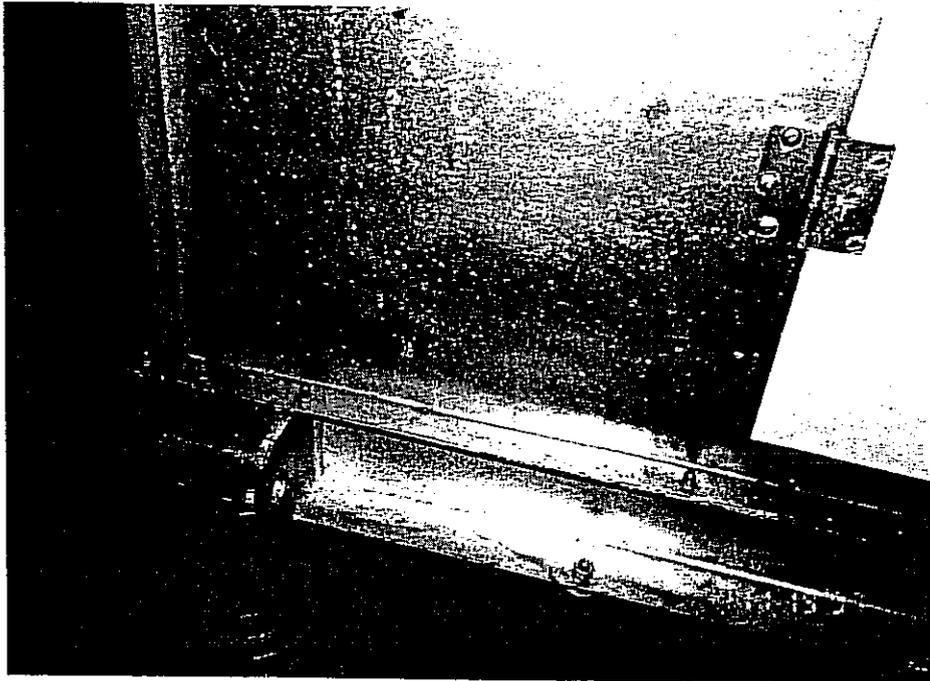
View of different type of anchorage for the mechanical equipment. This one is a rigid anchor type with no allowance for vibration. It connects the equipment rigidly to the foundation.
